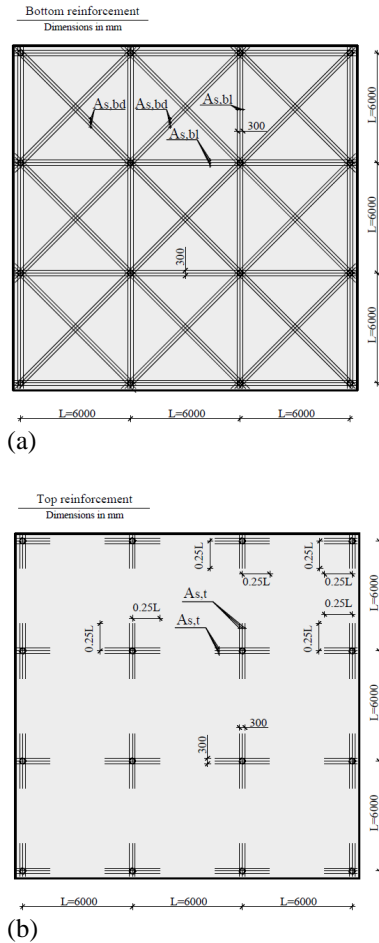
Layout of the conventional reinforcement proposed for HRC elevated slabs: bottom (a) and top (b) view. / Disposizione delle armature tradizionali nella piastra realizzata con HRC: armatura inferiore (a) e superiore (b).
